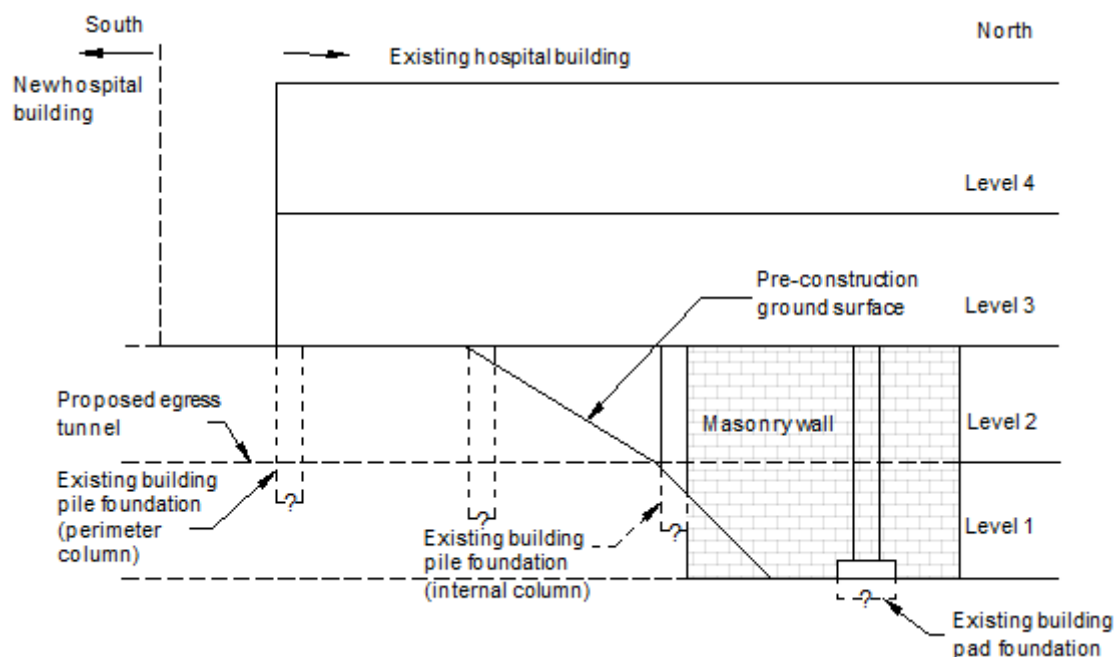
Long section of the egress tunnel prior to excavation and underpinning works
